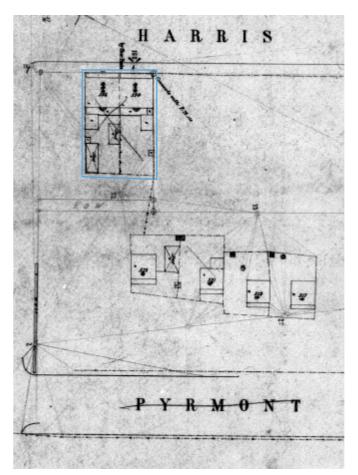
Detail from 1886 plan showing houses at 554–556 Pyrmont Street (Source: Sydney Water PWDS 1544-S206)
